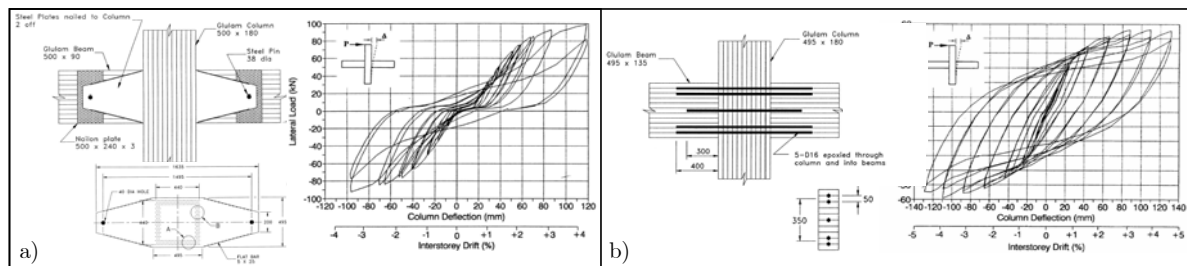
Layout and hysteresis loops for glulam frame systems: a) multiple-nailed connection; b) epoxyed rods (Buchanan & Fairweather, 1993).
